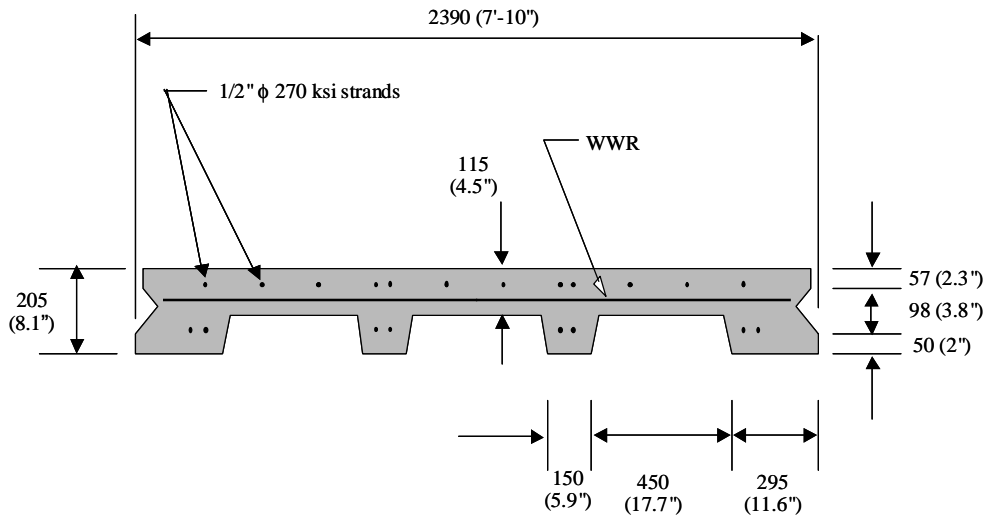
Section A-A, Typical cross section of the precast panel
